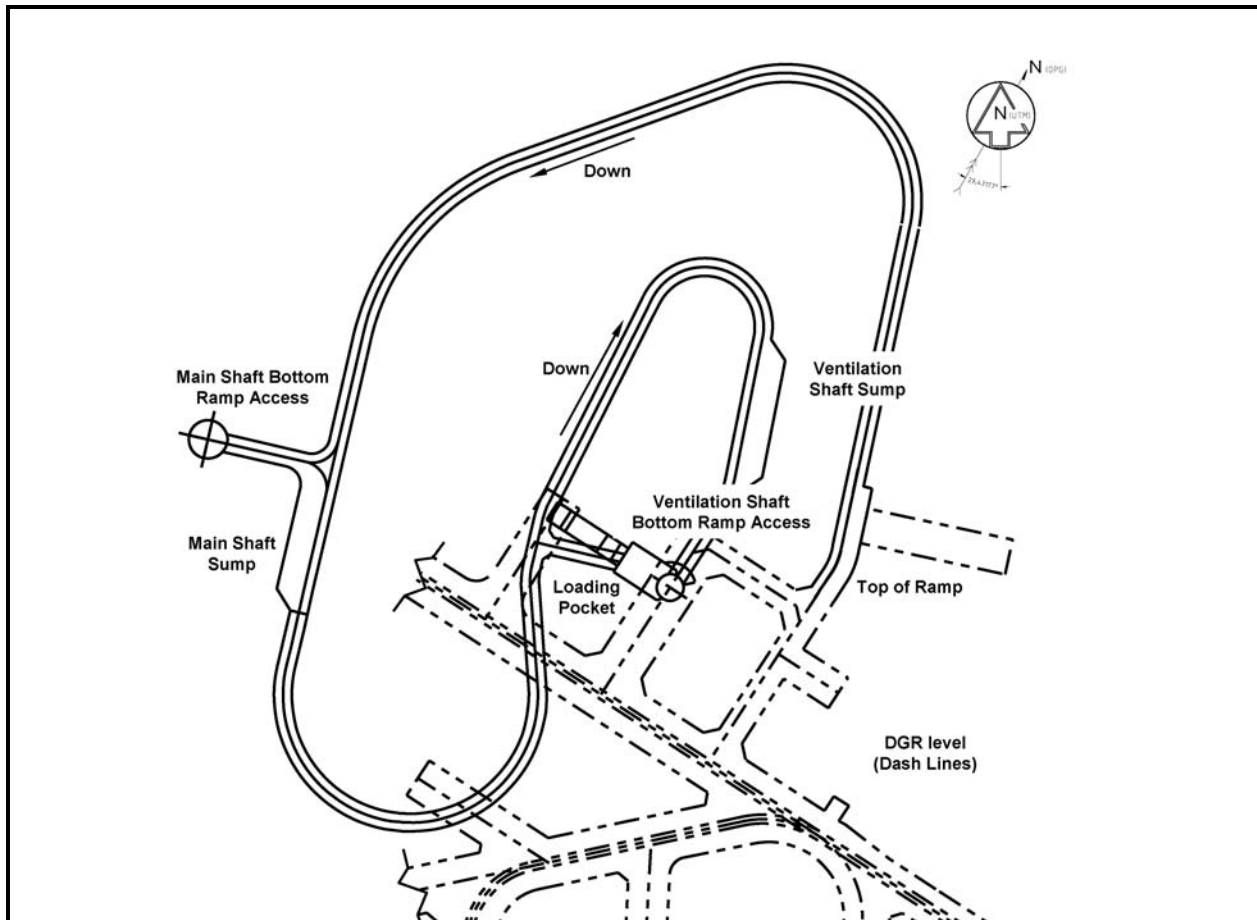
Shaft Bottom Ramp Concept Sketch
